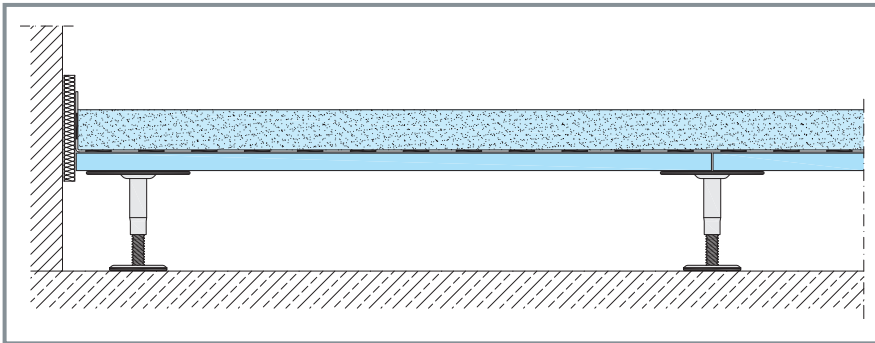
Hollow floors with shuttering panels made of gypsum boards and a flooring made of self-leveling screed
